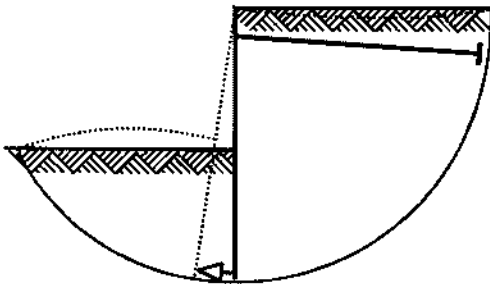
Shear failure of an anchored flexible retaining wall with a penetration which is too small.
